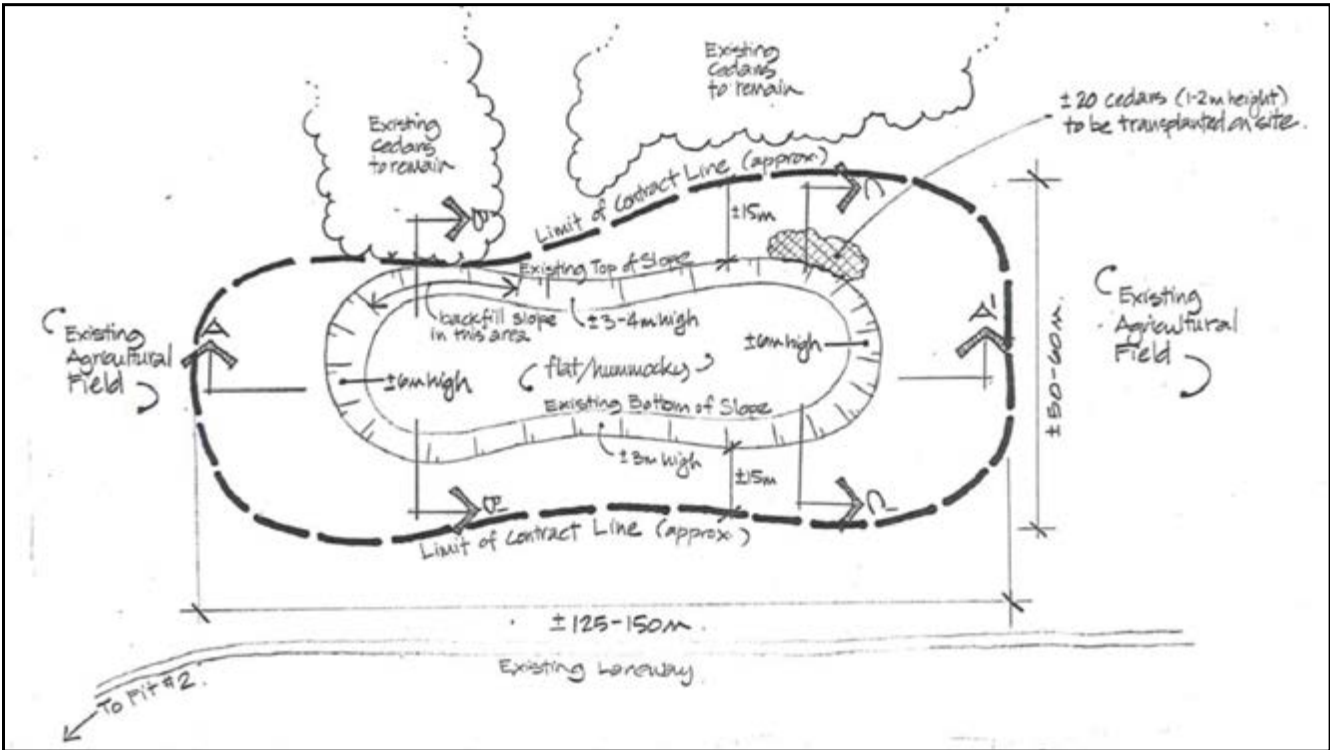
An example of a hand drawn rehabilitation design from 1998 illustrating how far site plans have come!
